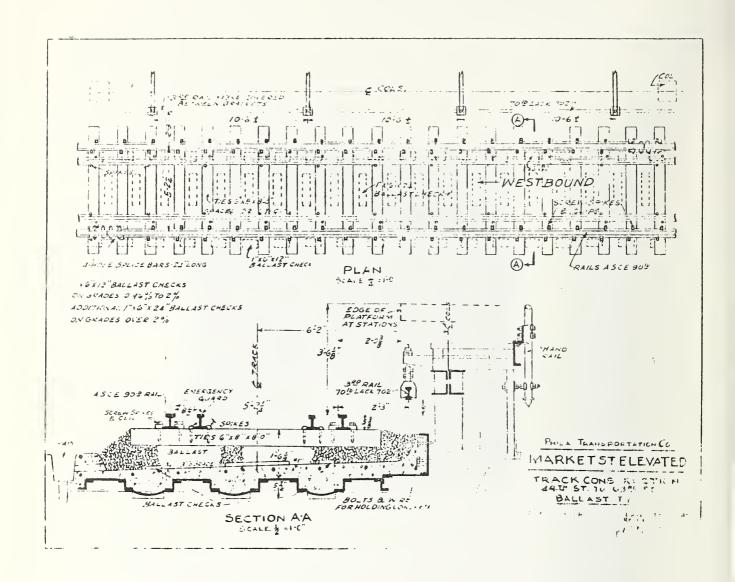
SEPTA MARKET ST. LINE ELEVATED STEEL STRUCTURE TRACK CONSTRUCTION
